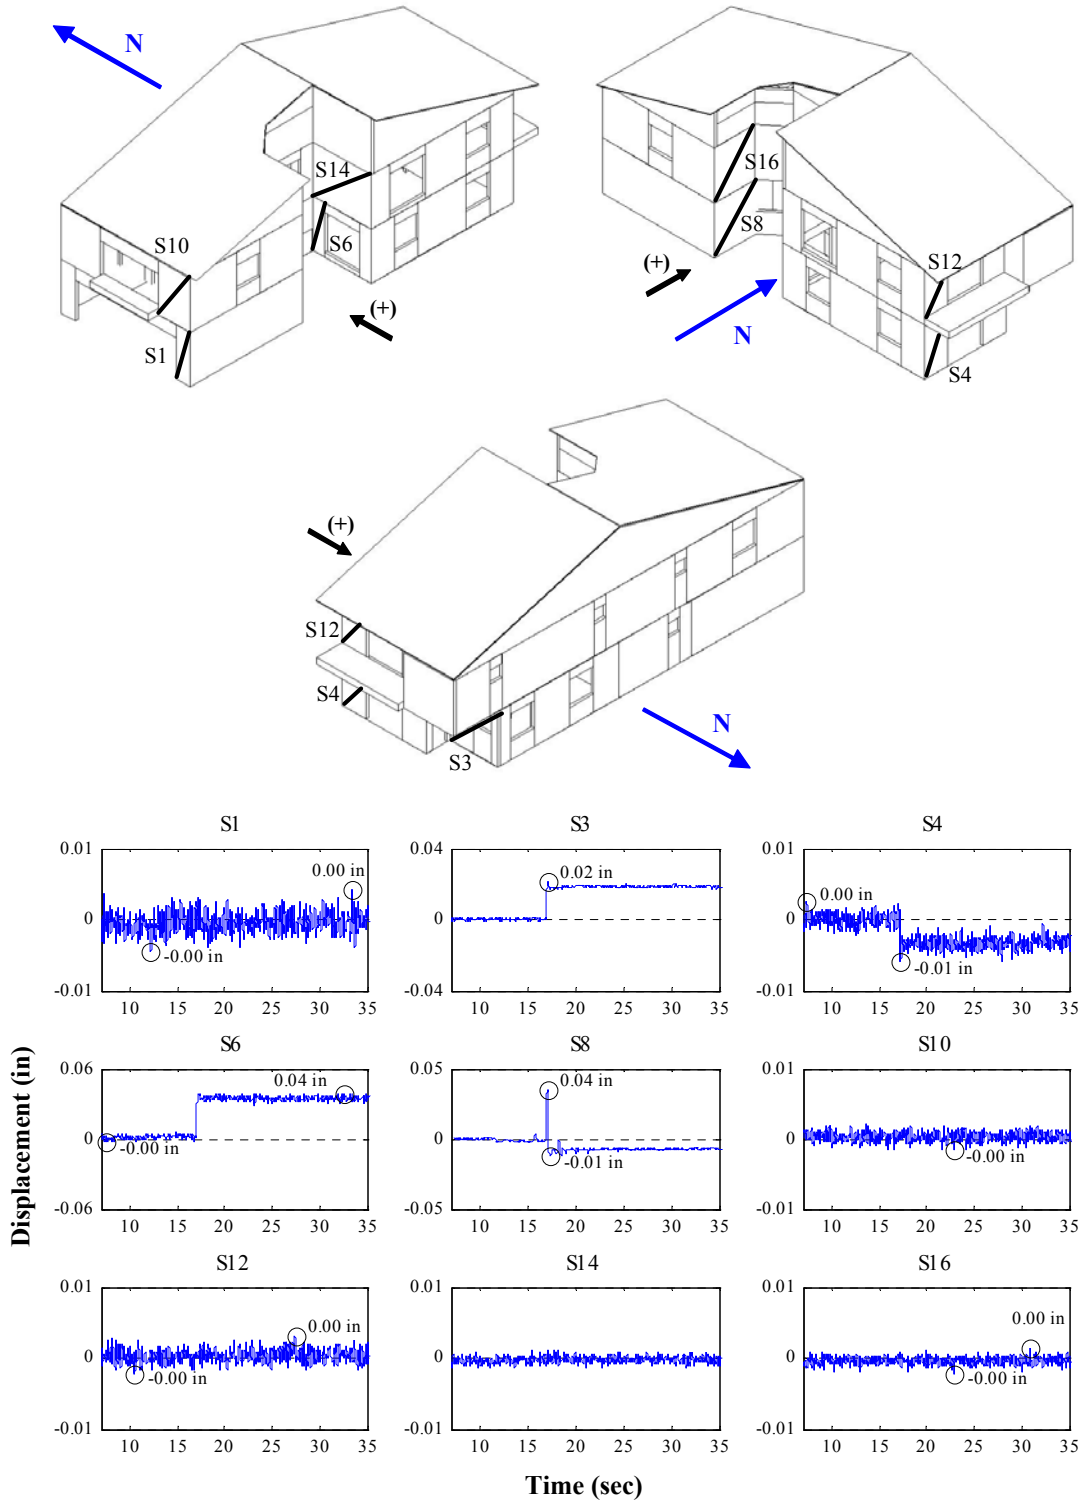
Wall deformations of north-south external walls for Test NWP1S02
